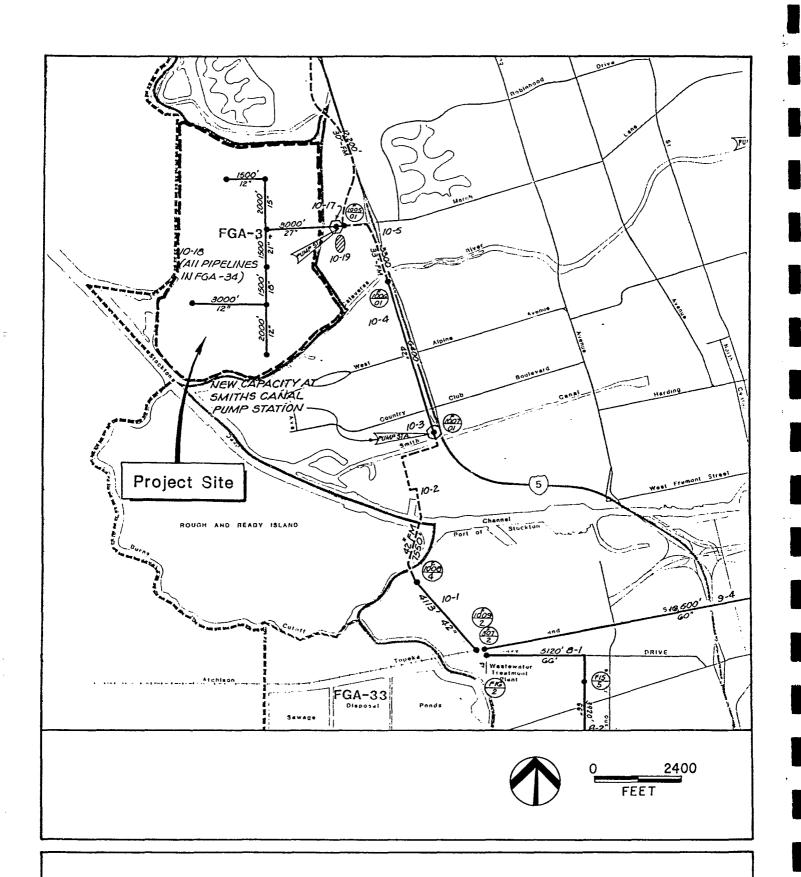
PROPOSED WASTEWATER FACILITIES
